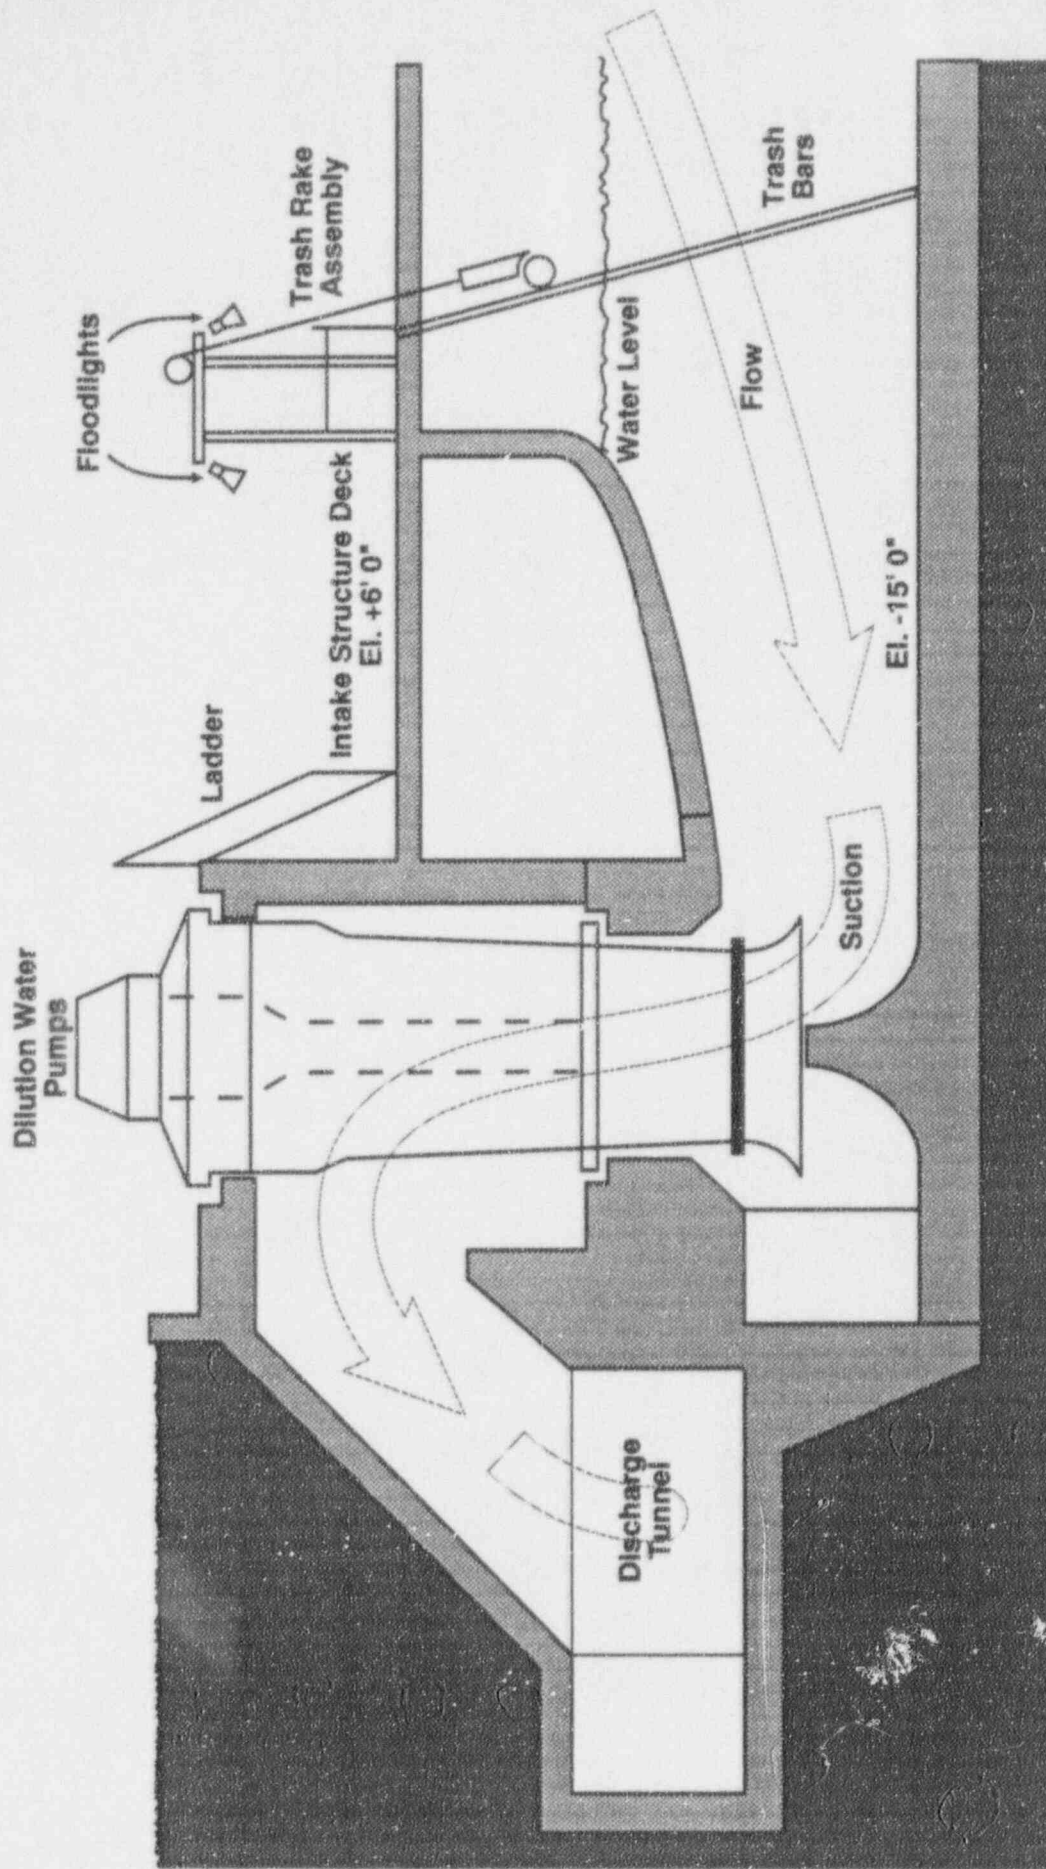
OCNGS Dilution Water System Intake Structure, Section View.
